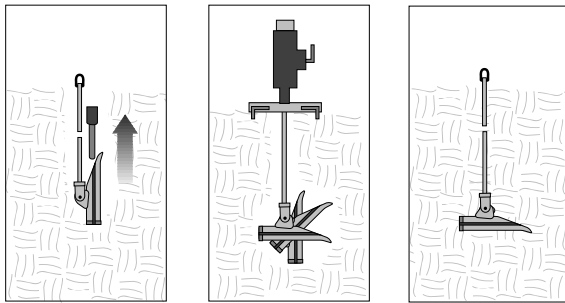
Manta anchor securement stages in seafloor (Breda and Gjerde, 1996).
